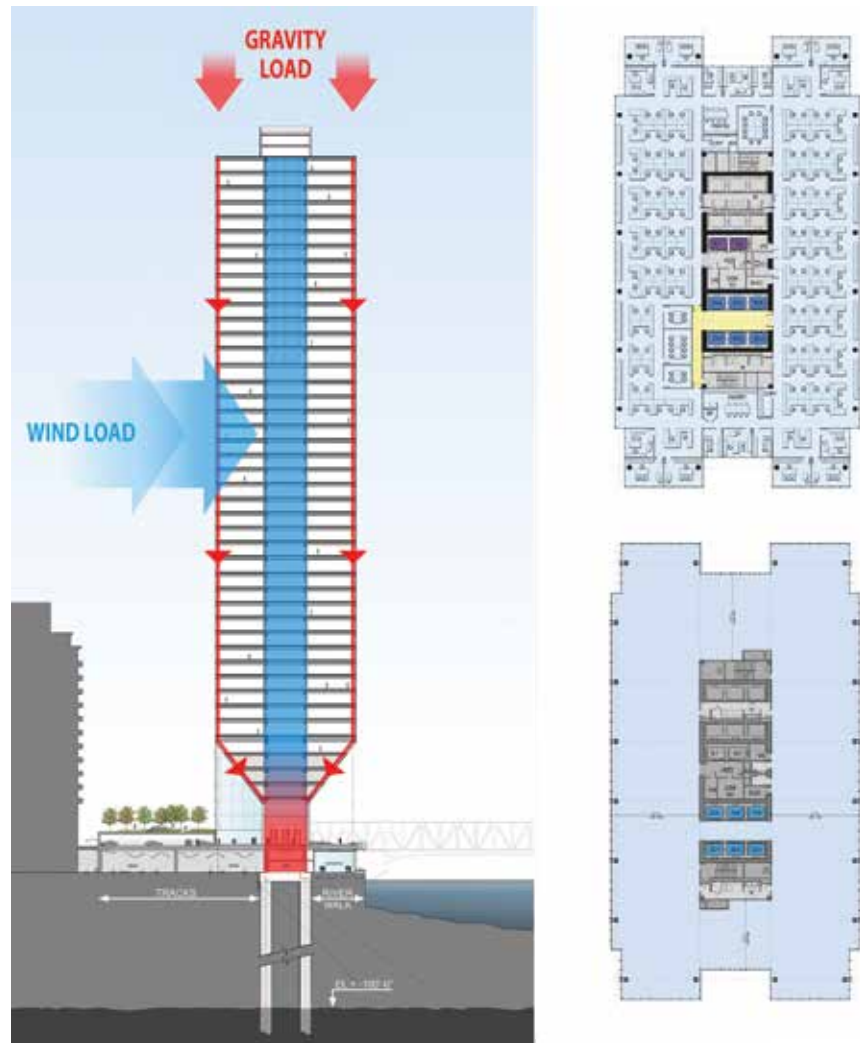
Load diagram and section of the tower with typical office floor plans. (Source: Goettsch Partners)
